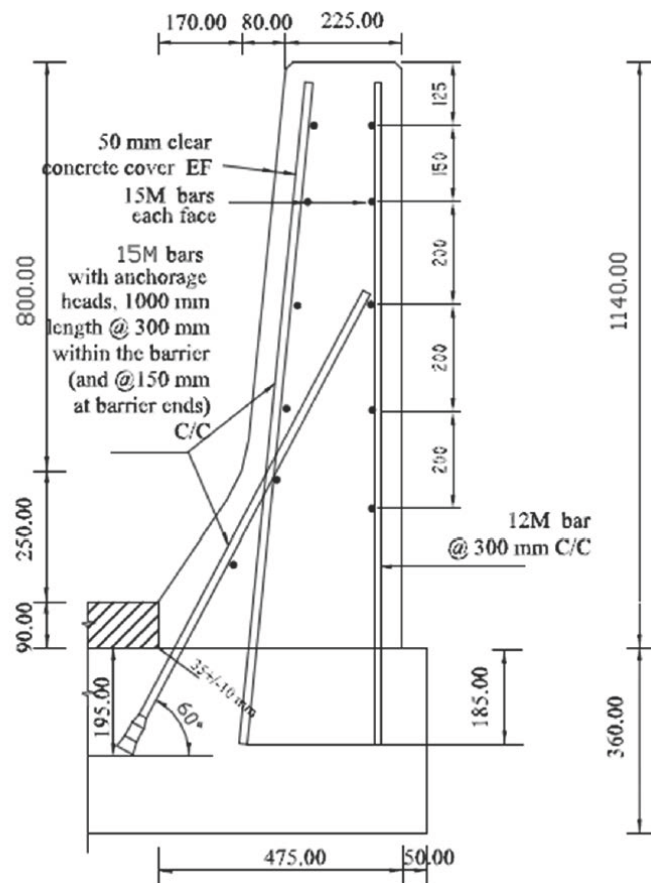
TL-5 Ryerson/Pultrall Parapet Cross Section [19]
